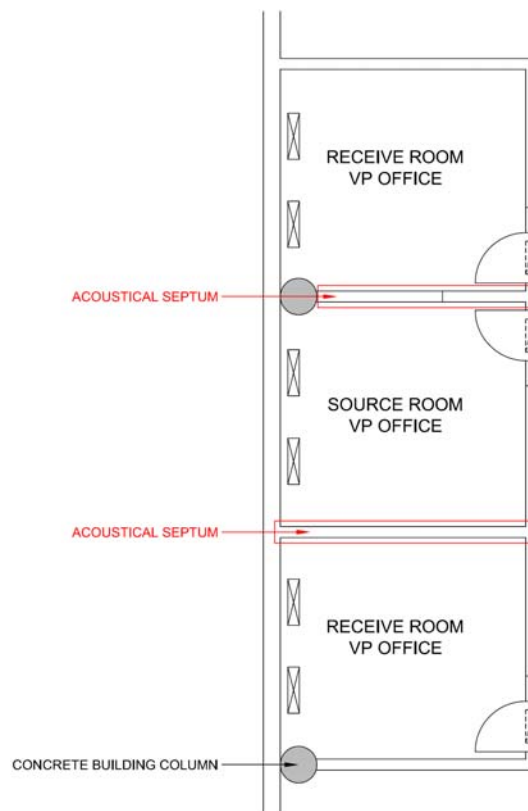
Sample Floor Plan Indicating Acoustical Septum Location
